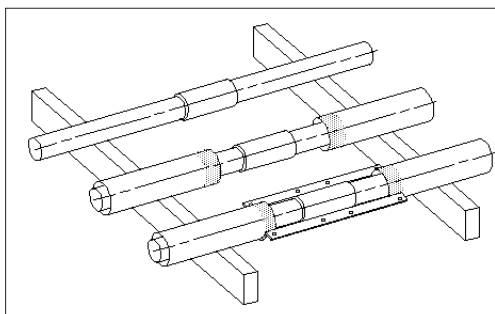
During layout, bonding and inspection, support the piping on 2x4 blocks to keep the joints clean and to keep bedding out of the pipe. Remove supports before burial
